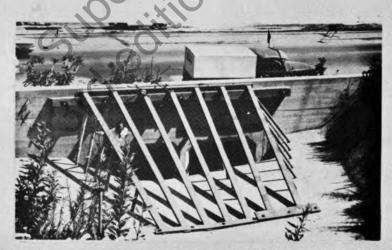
Steel grill debris rack with provision for cleanout afforded by concrete paved area in foreground.
